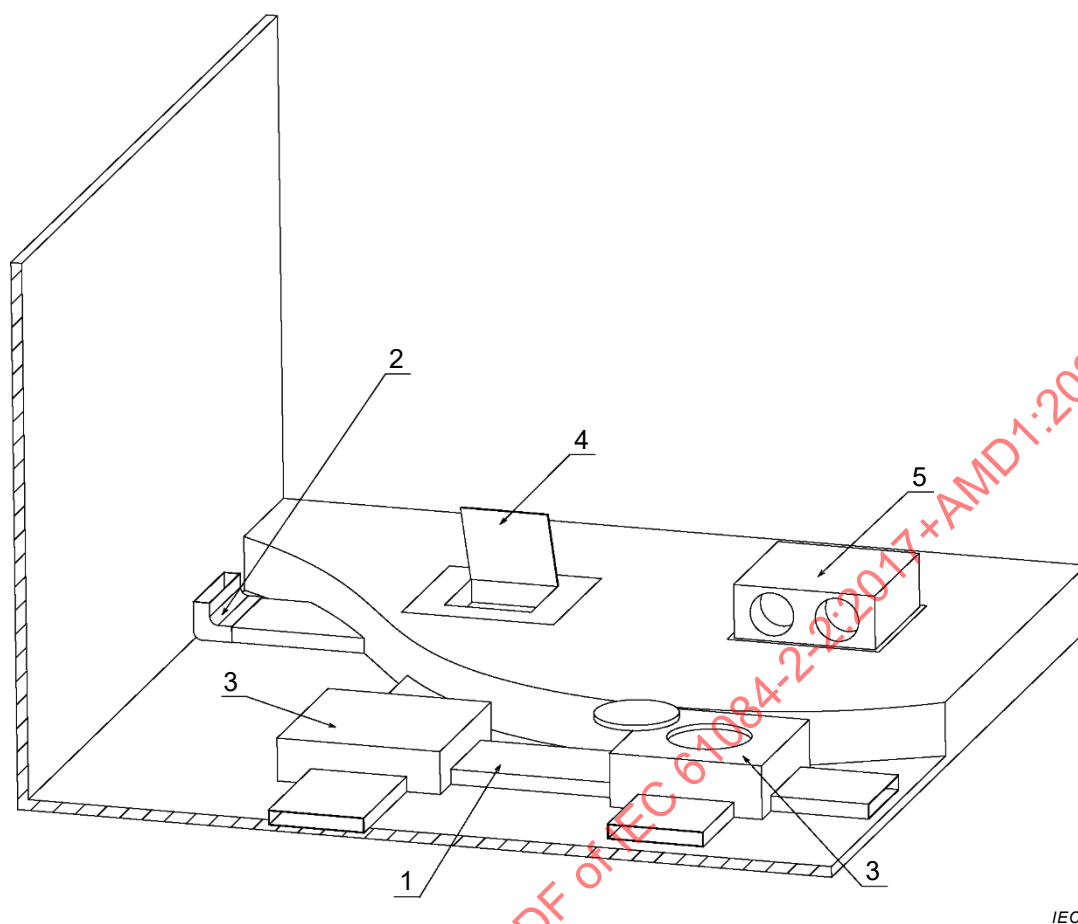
Underfloor CTS/CDS – Installed under a raised floor
